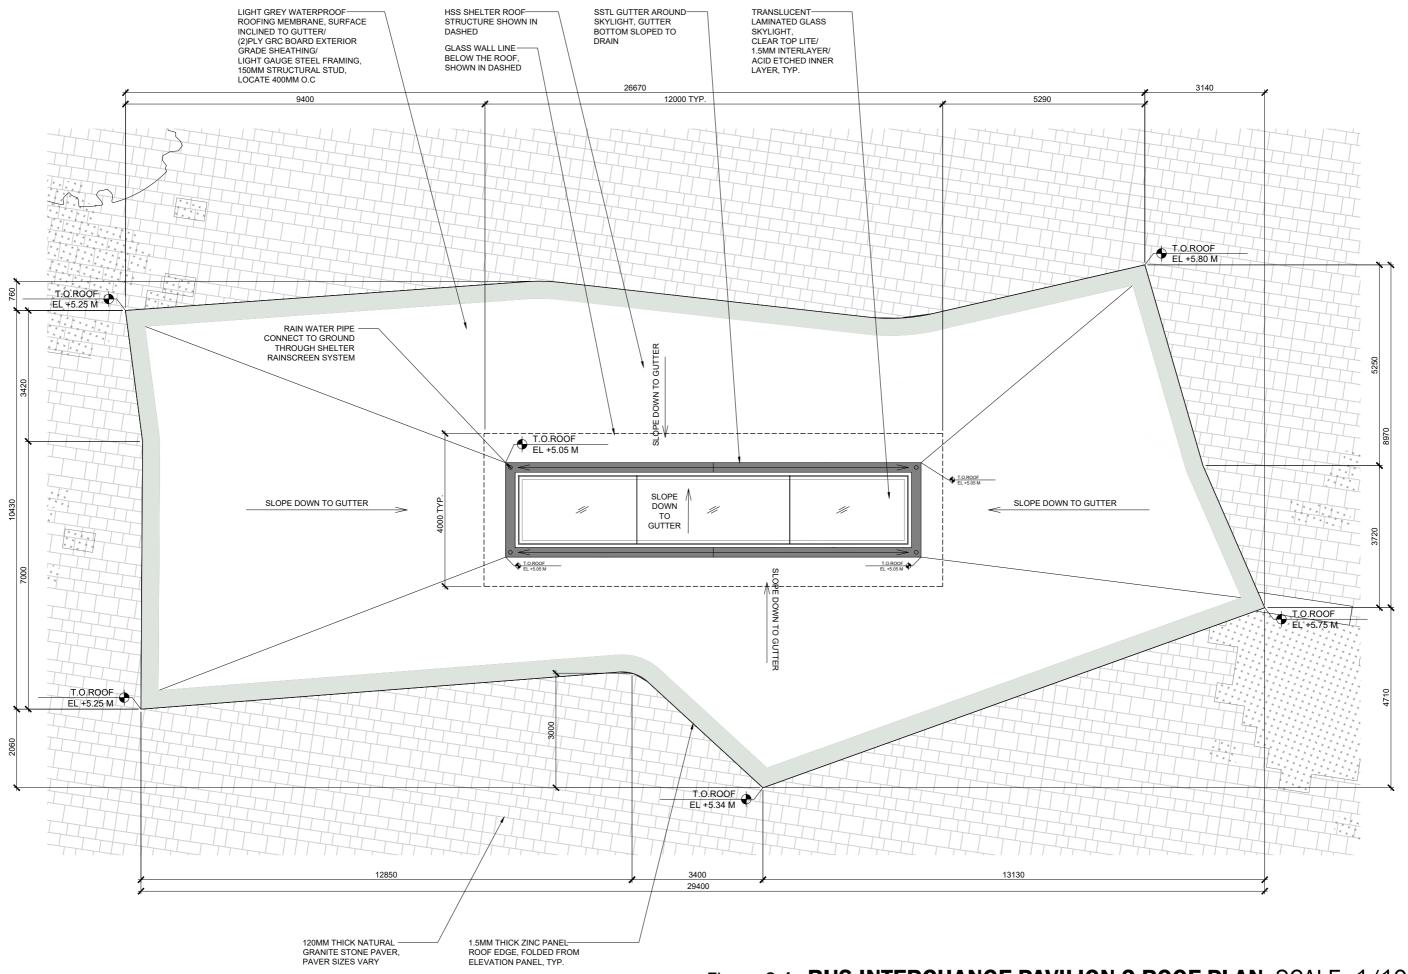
BUS INTERCHANGE PAVILION 2 ROOF PLAN, SCALE=1/100
